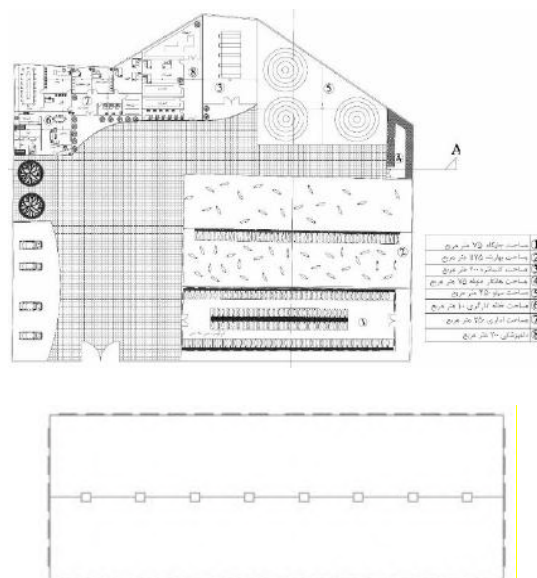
The plan of the cattle farm under investigation; Top: Ground floor plan and livestock accommodation, Bottom: Roof plan of cattle breeding
